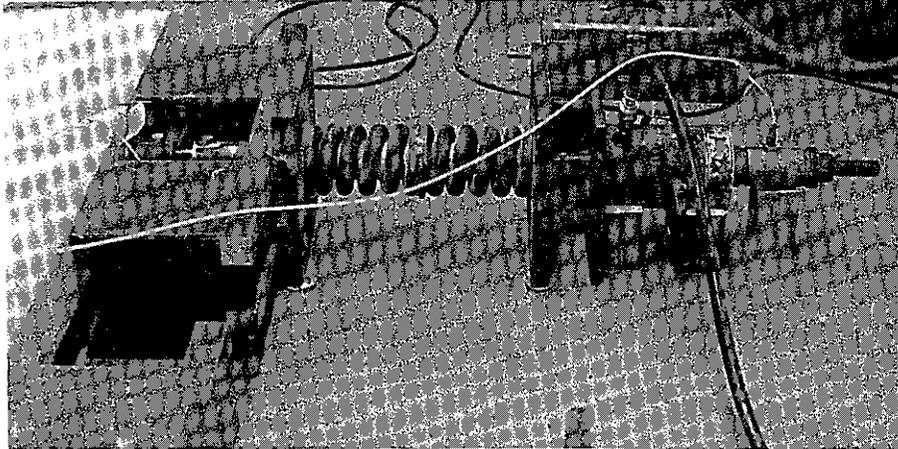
Testing apparatus used to apply sustained loads to resin capsule anchors installed in the edge of a slab in horizontal holes (Test Series 3 and 4).
